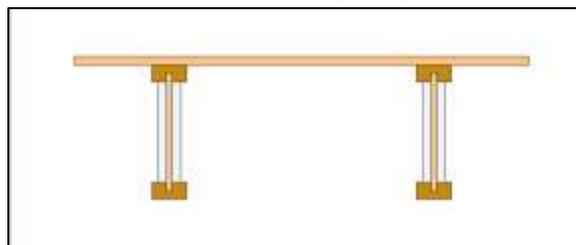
side view of the installation of 12.5 mm (1/2 in.) regular gypsum board to protect web of I-joist
